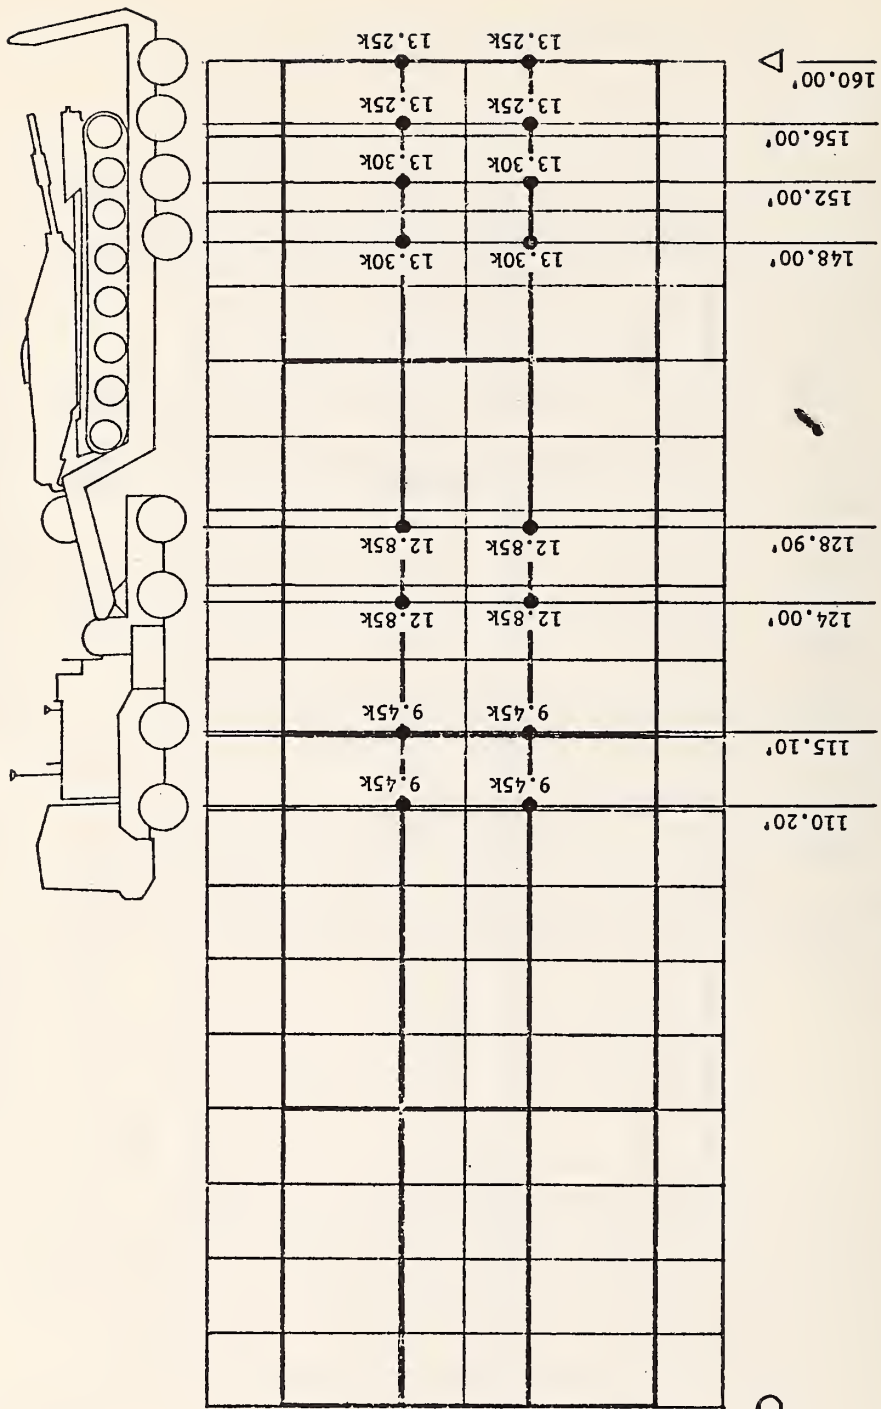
LOAD CONDITION 5, BRIDGE 1. REAR WHEEL OF TRAILER AT CENTER OF BRIDGE.
